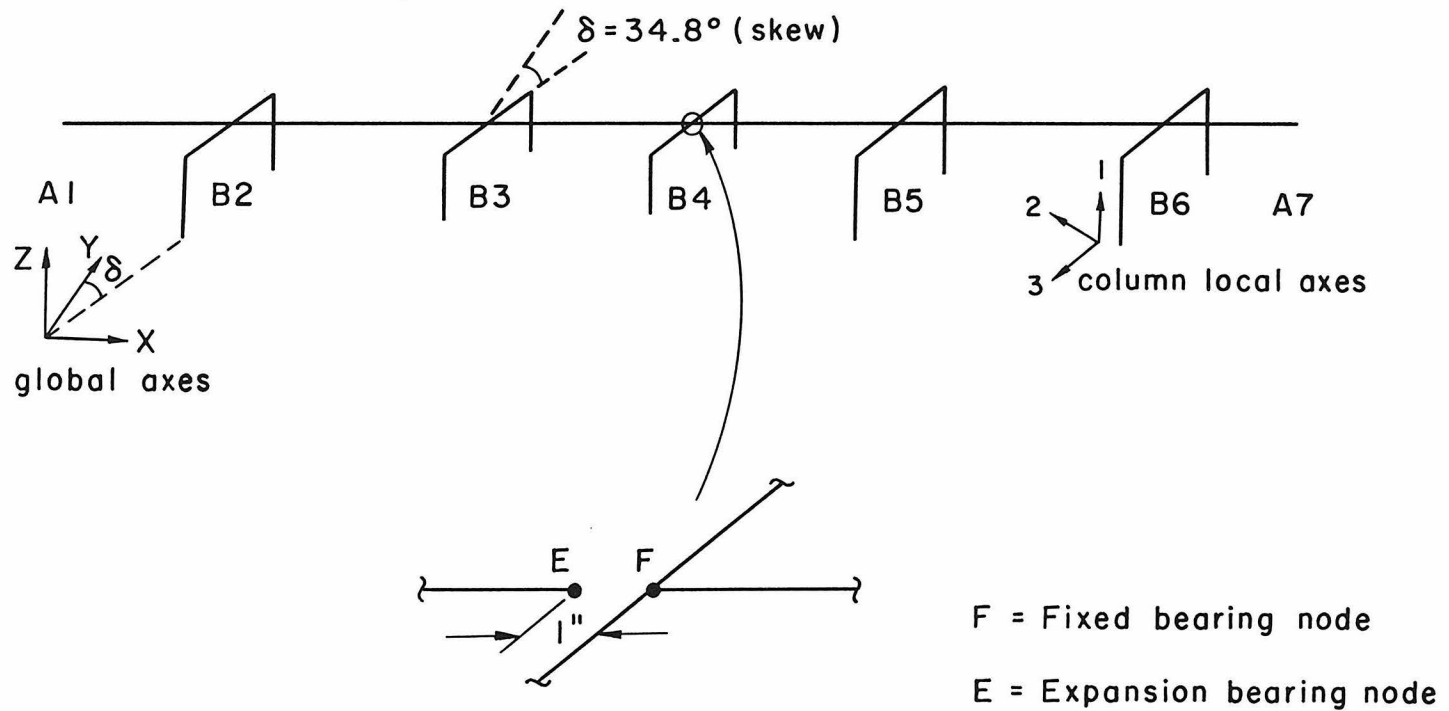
Finite Element Model of the San Juan Bautista Bridge
